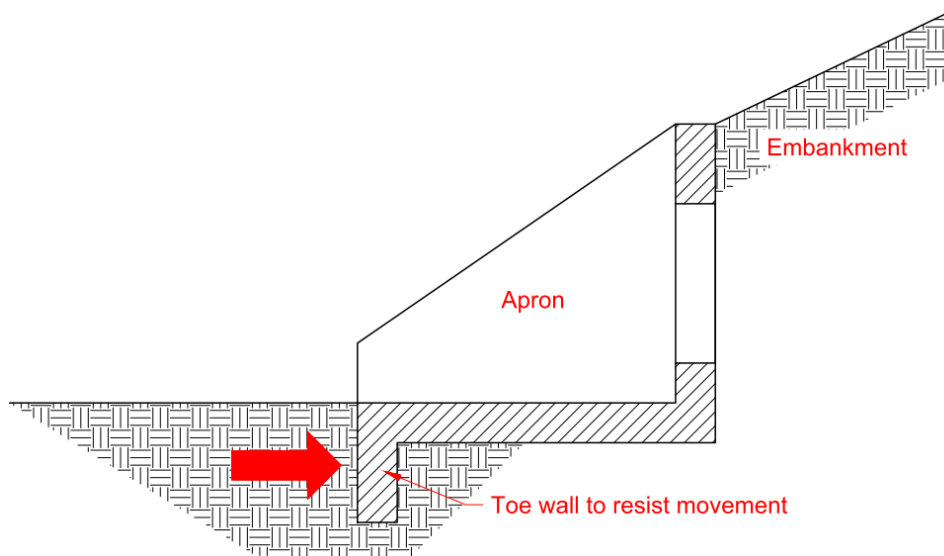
Schematic of an apron with a toe wall for anchorage
